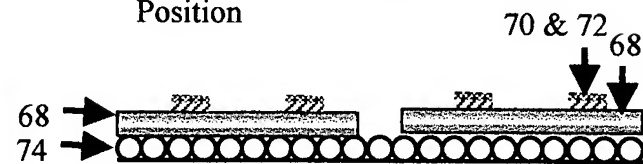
Cross Sectional View Of Bottom Panel And Top View of End Panels Packed For Shipping and Storage
